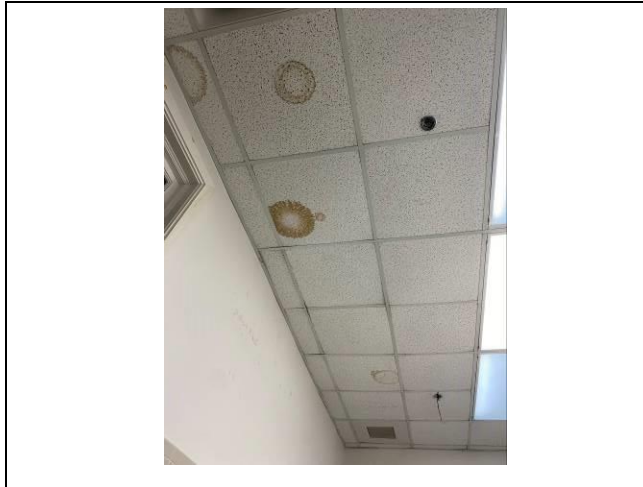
Water Damaged Ceiling Tile in Men's Bathroom Second Floor
